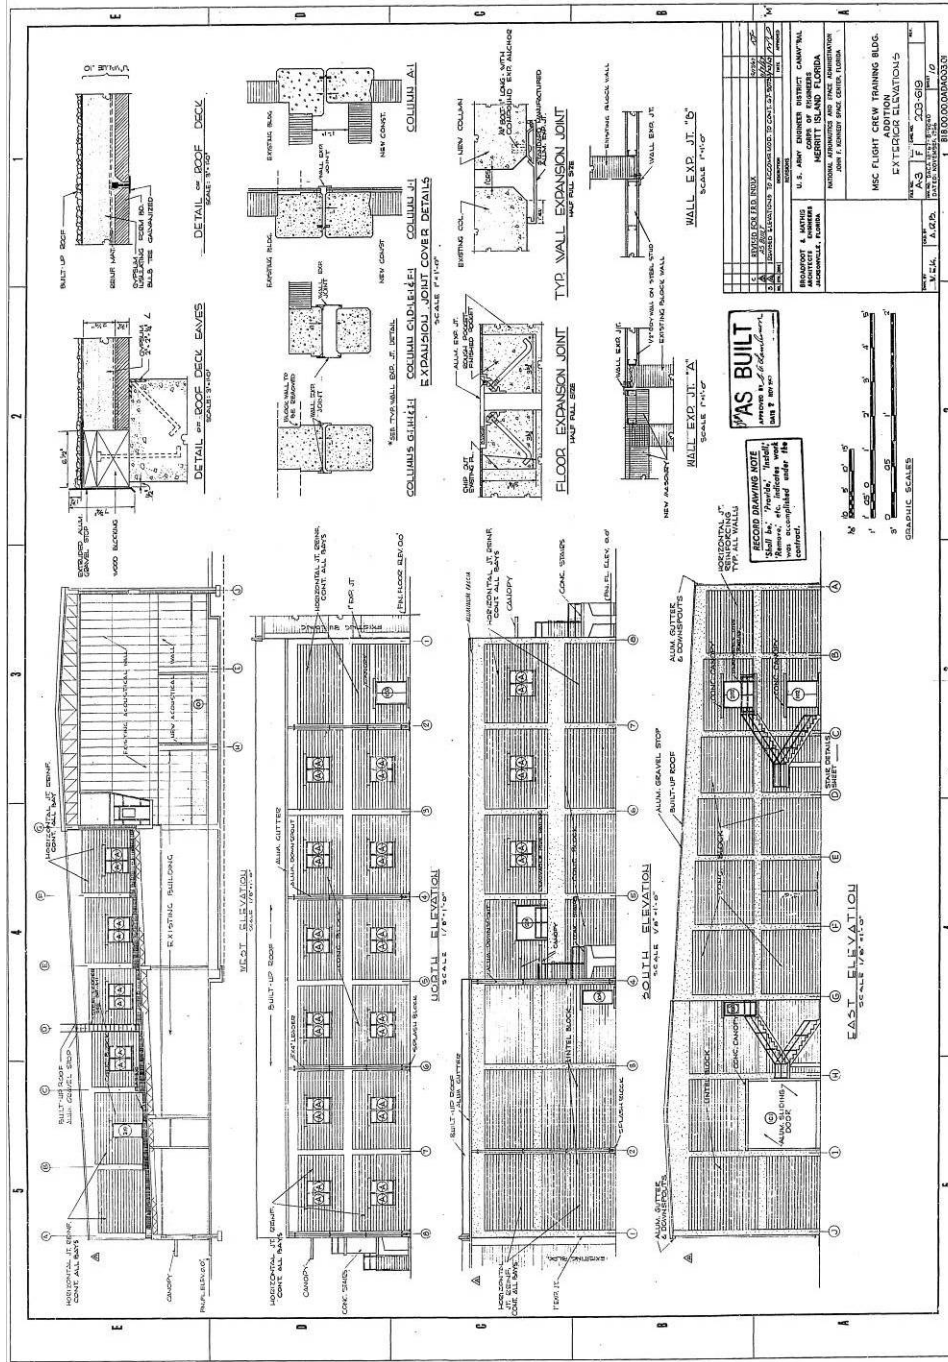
Broadfoot & Mathis, Flight Crew Training Building Addition, Elevations, November 1966, Sheet 10.
